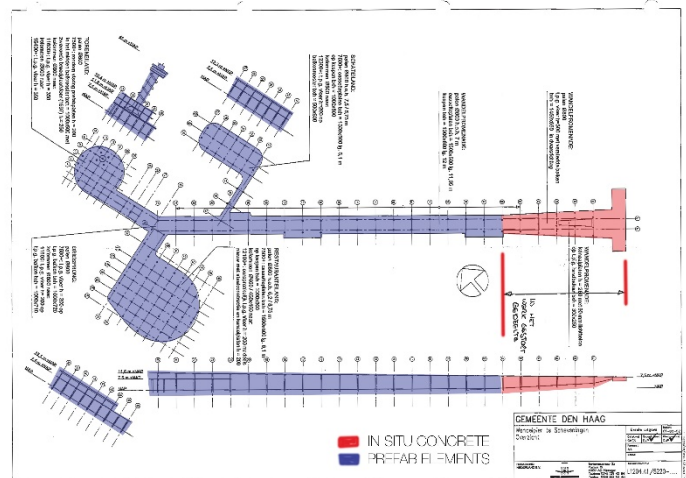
| Concrete analysis Pier of Scheveningen (IJsselstijn, 2014)
